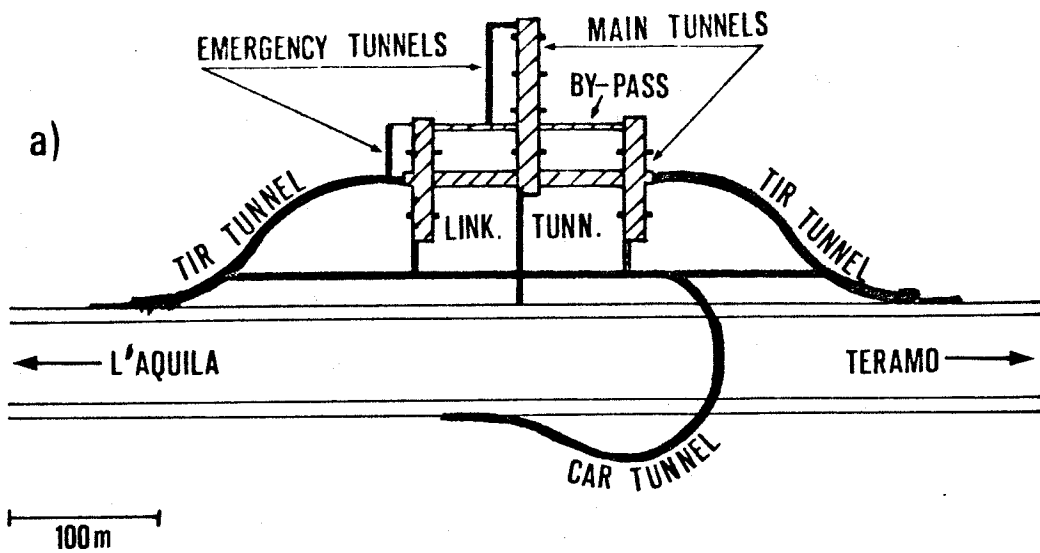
a) General plan of Laboratory (three "Main Tunnels" connected by a linking tunnel) and access to it.
